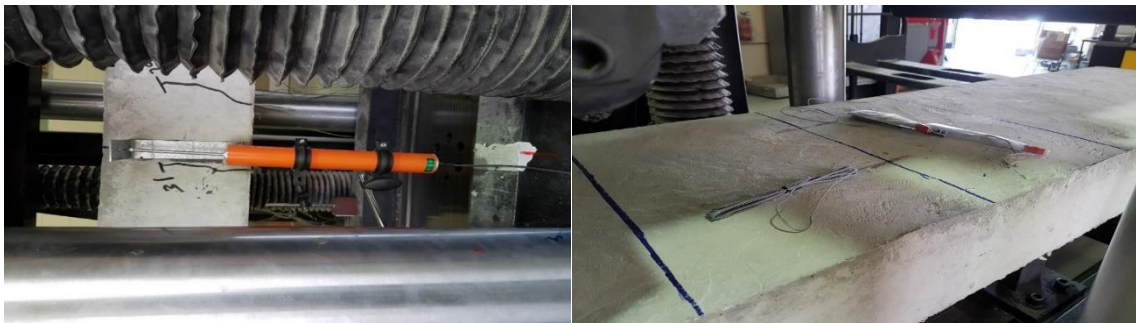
Top View of One-Way Concrete Slab Showing Locations of LVDTs and Concrete Strain Gauges
